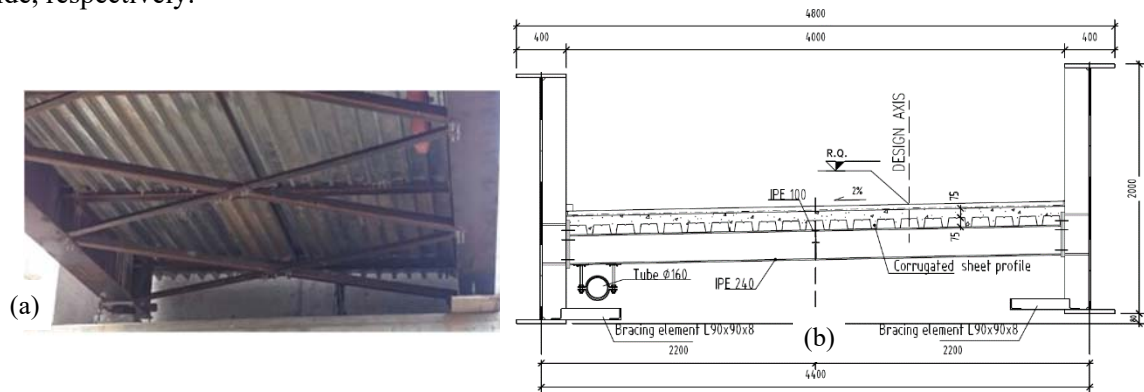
Lambro footbridge: (a) view from below; and (b) cross-section (adapted from [18]).
